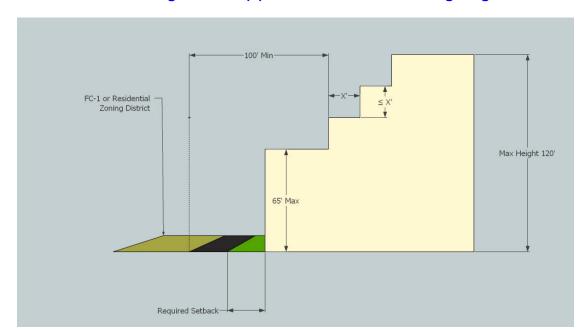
(b)-2: FC-2 Maximum Building Height
